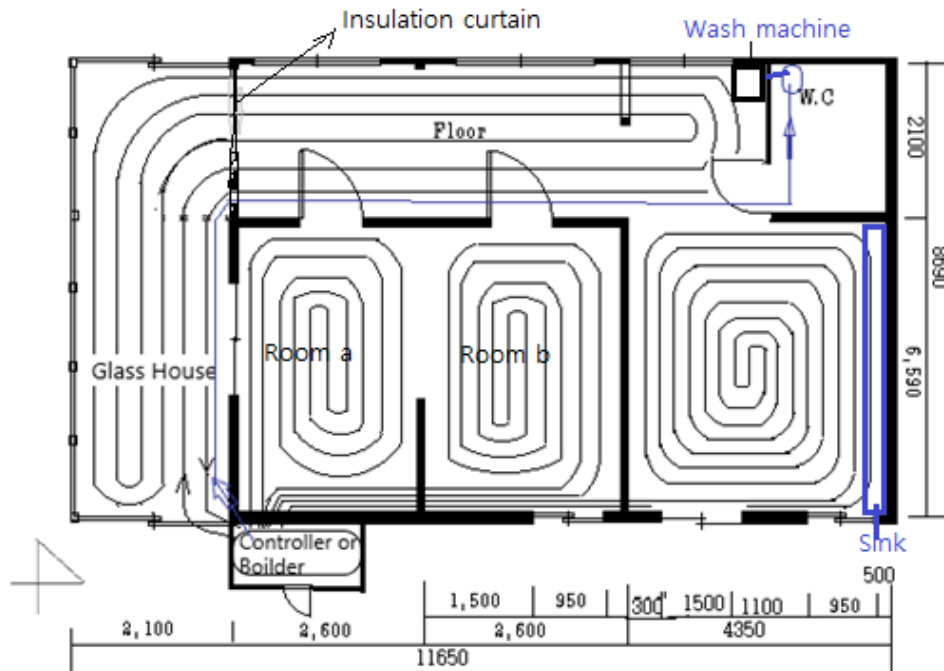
Floor Plan of radiant cooling and heating system with an attached glass house
